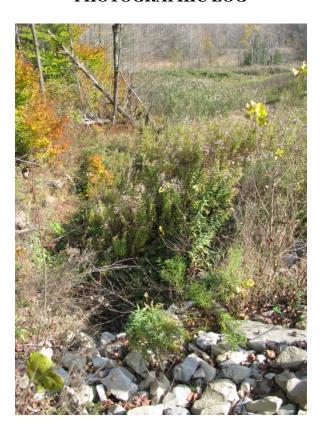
10/18/12 Erosion occurring at area where rip-rap terminates. Looking east towards North Detention Pond.
